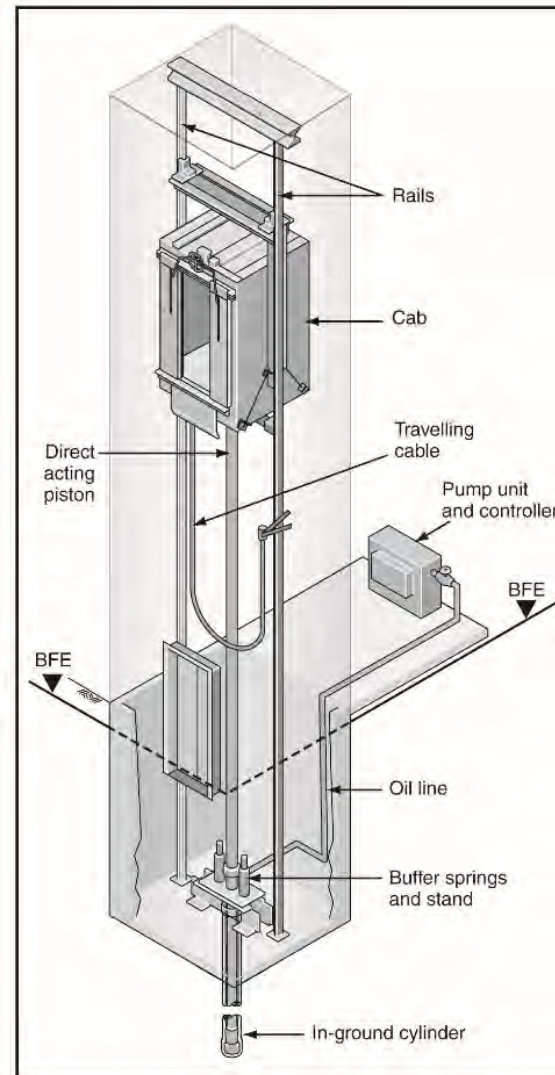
Direct Acting (Holed) Hydraulic Elevator
